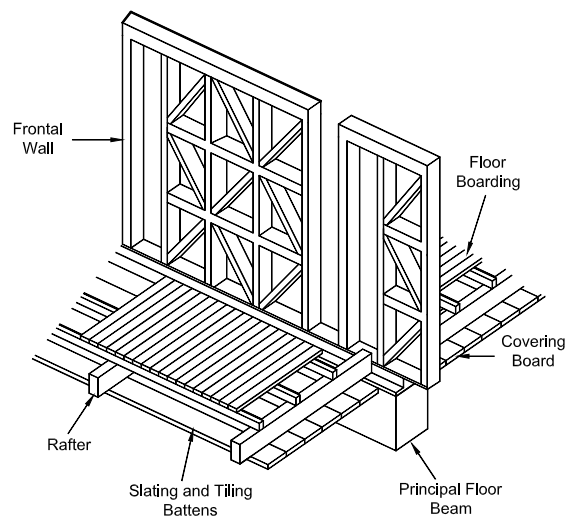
Internal timber wall arrangement for downtown Lisbon: example of a composite timber-masonry wall.
